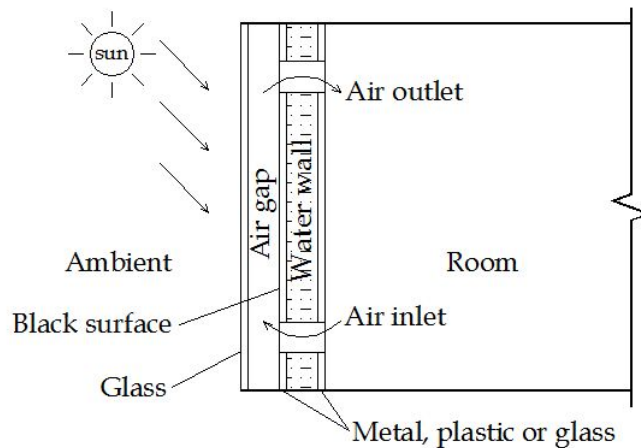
Sketch of a water wall with solar chimney (self-ventilation mode).
